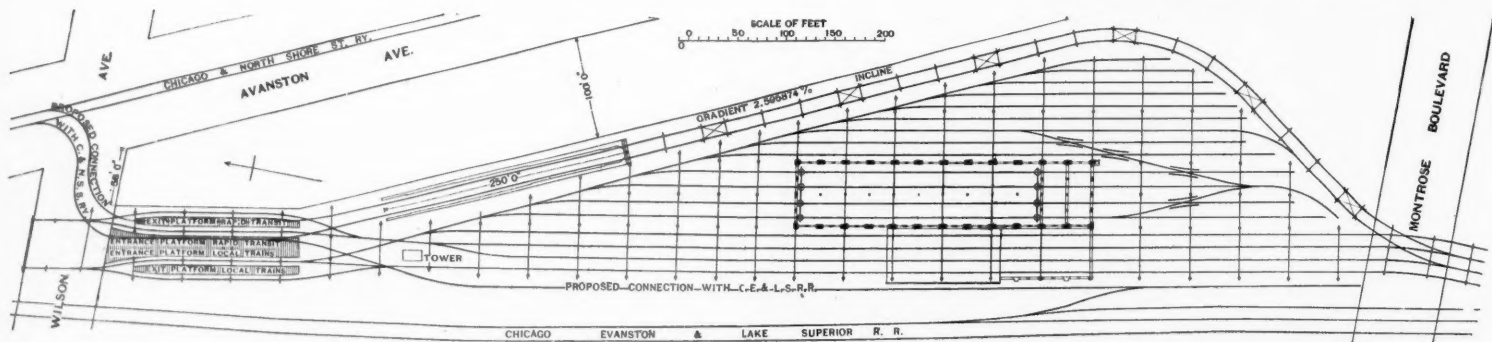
Plan of Yard, Northwestern and Union Elevated Railroads.
